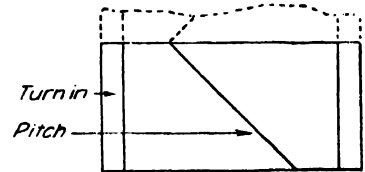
Method of cutting single step flashing from sheet with economy, the angle of the roof controlling the pitch and width of the cut piece.
